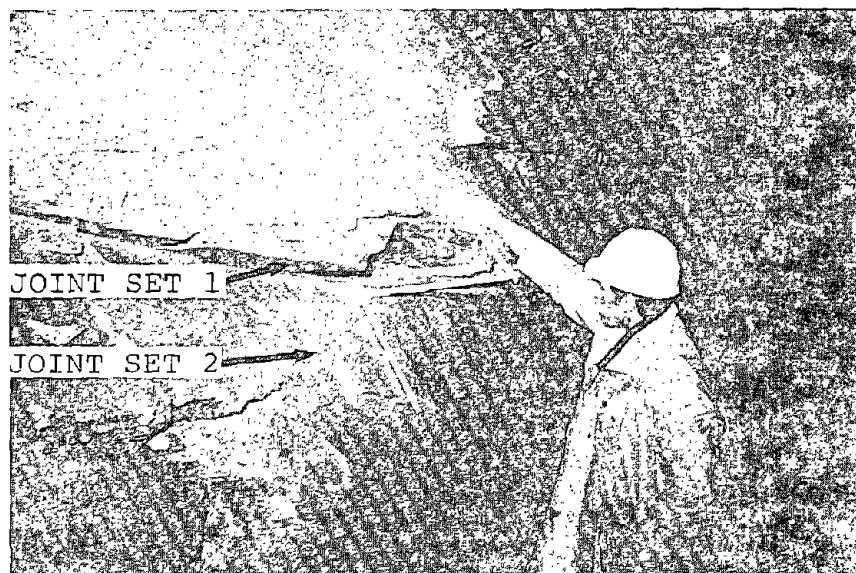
OVERBREAK IN SOUTH RIB OF EAST-WEST ACCESS TUNNEL CONTROLLED BY JOINT SETS 1 AND 2.
